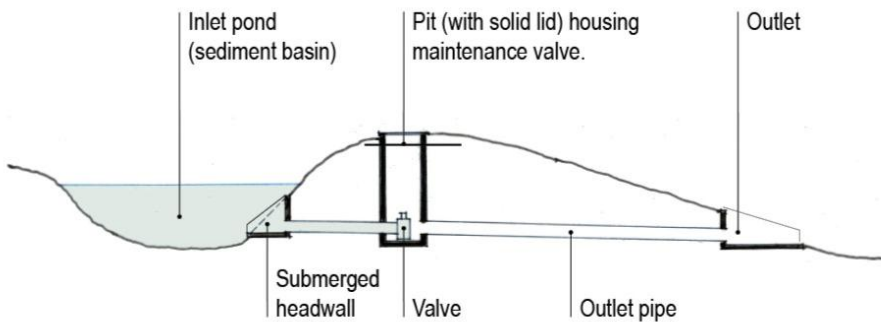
Sketch of the pipe connection to drain the inlet pond for maintenance.
